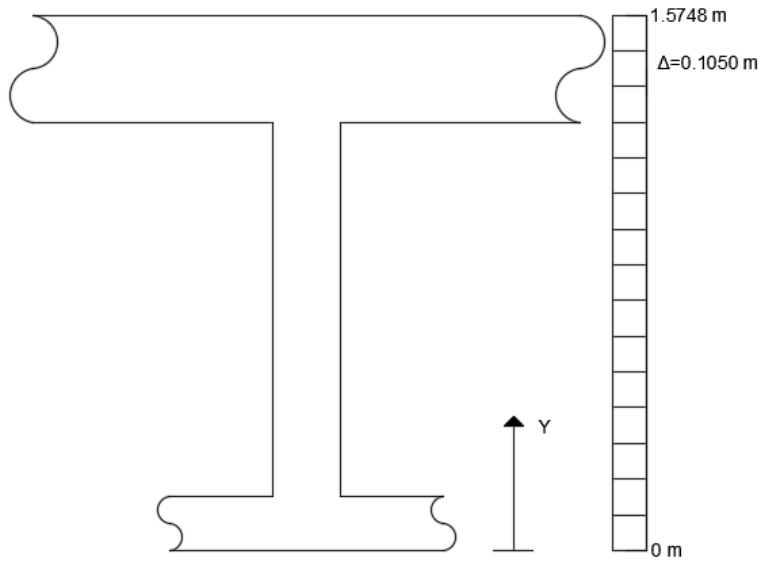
Hypothetical concrete bridge girder discretized for heat flow
